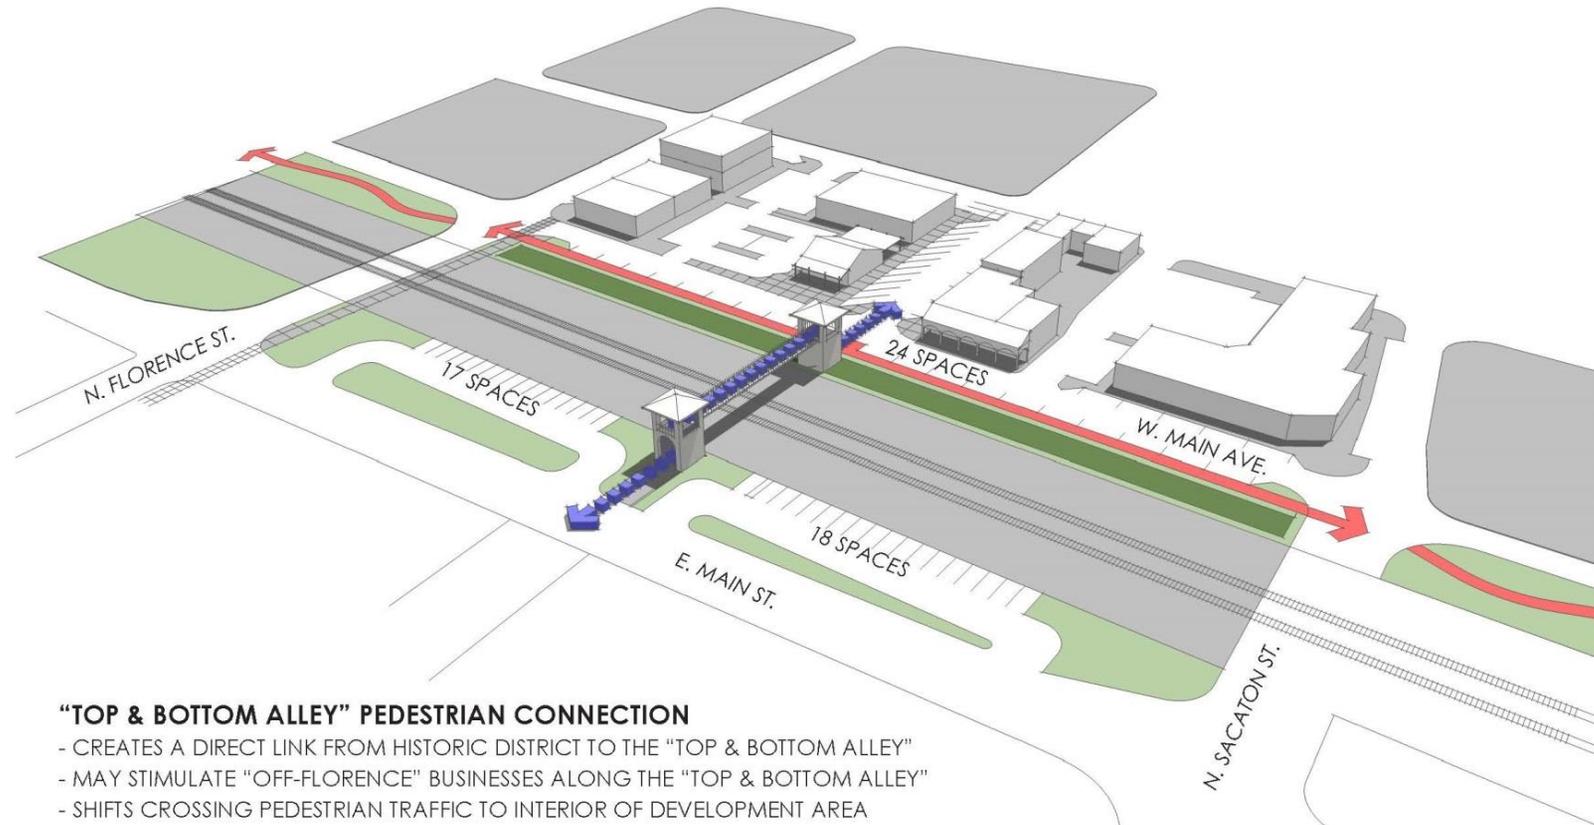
Proposed Circulation with Iconic Pedestrian Bridge
